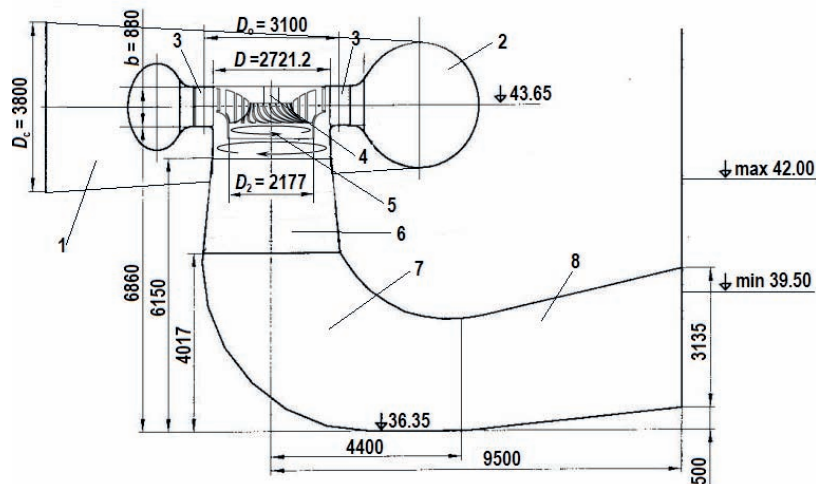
Flowing part of the turbine unit: 1 – water supply pipe, 2 – spiral chamber, 3 – guide vanes of the hydro turbine, 4 – air duct, 5 – working wheel chamber with counter-vortex damper, 6 – suction pipe cone, 7 – suction pipe elbow, 8 – diffuser
